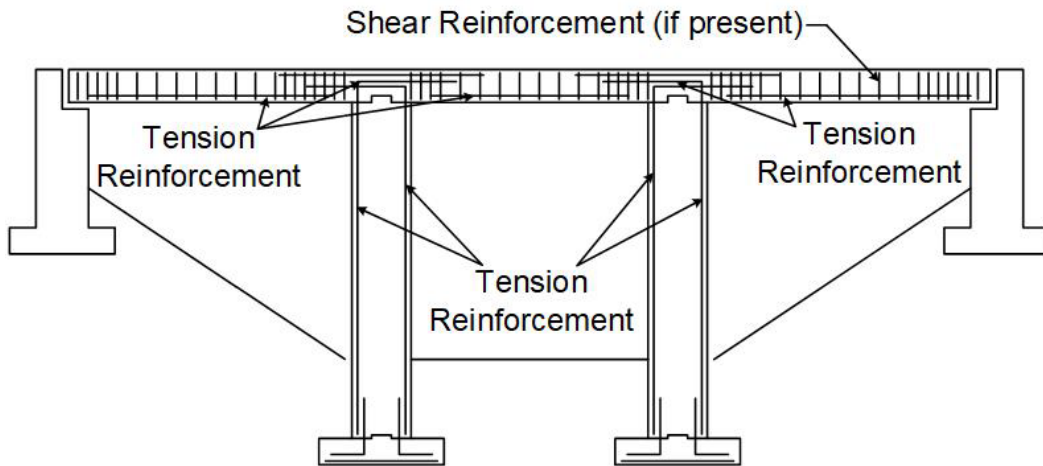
Primary Reinforcement in a Multi-span Slab or Beam Frame
